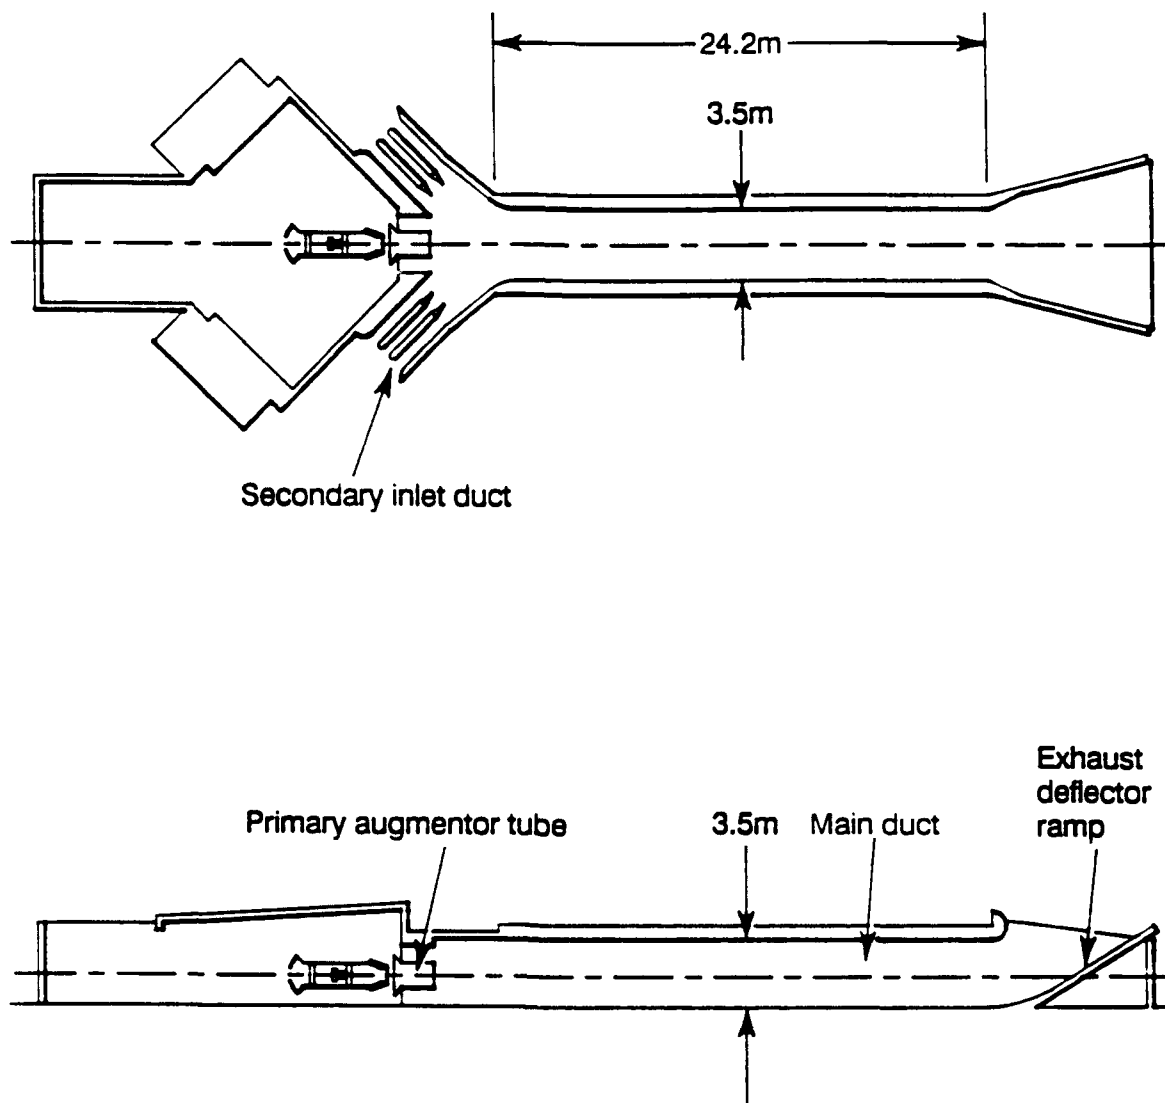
UNINSTALLED ENGINE TEST FACILITY - FINAL DESIGN
